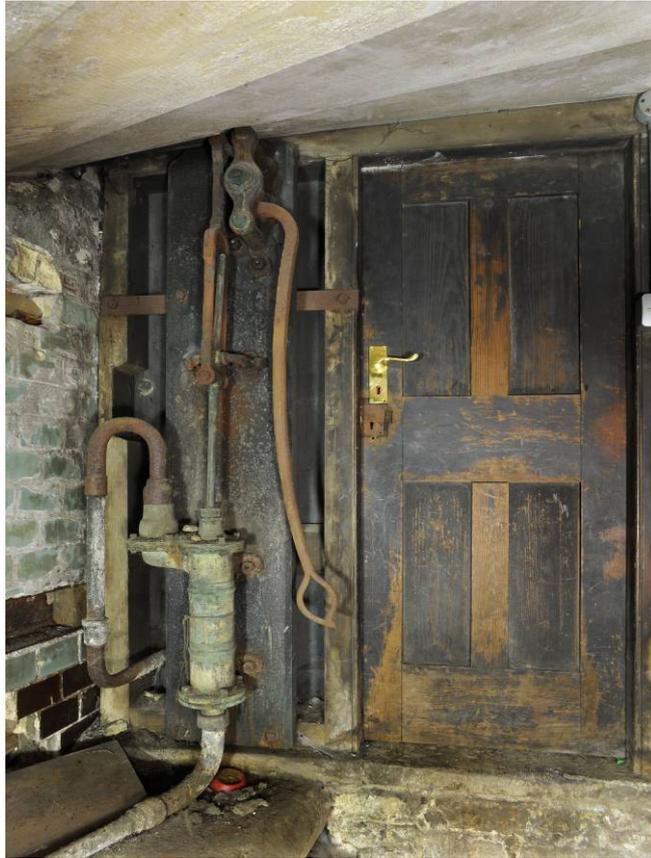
The hydraulic hand crank, below the geometric staircase, lower ground floor level looking west
